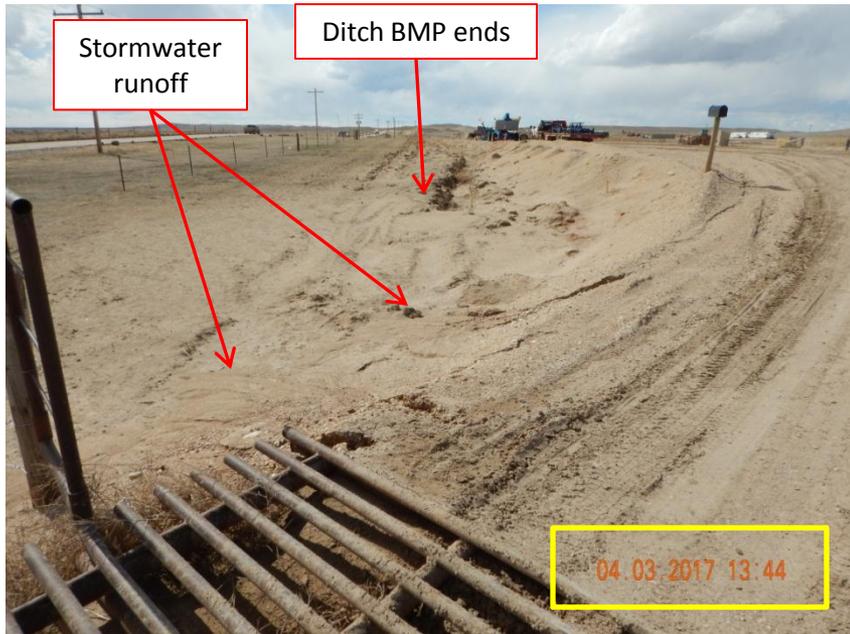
Photo taken 4/3/2017 from the west well pad, east entrance, facing West. Wind and stormwater runoff erosion evident along portions of the location perimeter. Fill slopes have not been stabilized along the location perimeter to prevent wind erosion.
